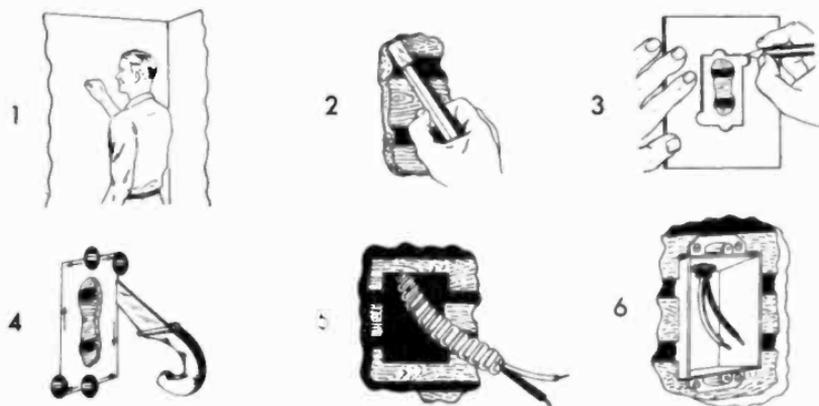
Step-by-step procedure for installing a switch or outlet box in a lathed and plastered wall. (1) Find space in the wall approximately between joists, by tapping and listening for hollow sound, or using a magnetic nail finder. (2) Notch out a section of the plaster with a screwdriver or chisel, to locate a spot where one lath board will be in the center of the cutout. (3) Use the template you made from Fig. 4-11 and draw the outline of the cutout. (4) Drill the four holes shown in the template. Cut out the plaster with a keyhole saw, starting from the corner holes. Do not cut through the upper and lower lath boards; cut out only the center one. (5) Draw the cable through from behind the wall and install it into the outlet or switch box. (6) Set the box in place and screw the ears to the upper and lower lath with wood screws. The ears are adjustable on the box and should be set beforehand so the front edge of the box is flush with the front surface of the wall.
